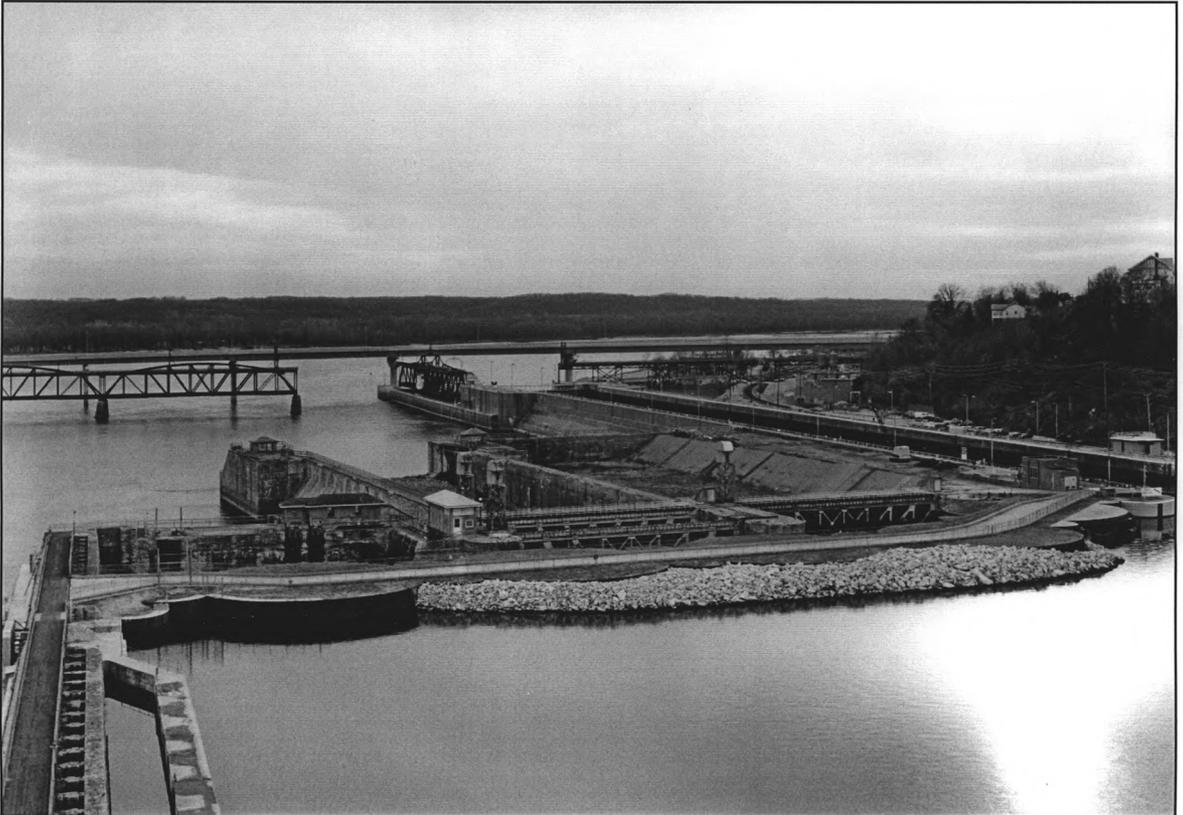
General View of Old Lock, Dry Dock, and Sheet Pile Cell Closure Wall. New lock and Keokuk Municipal Bridge in background. Taken before construction of new bridge.
